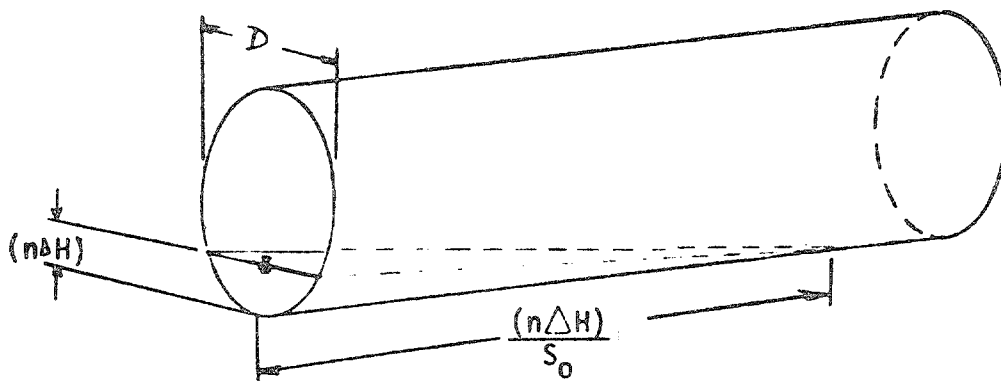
Horizontal Water Surface Intersecting Inside Surface of a Sloping Circular Pipe
